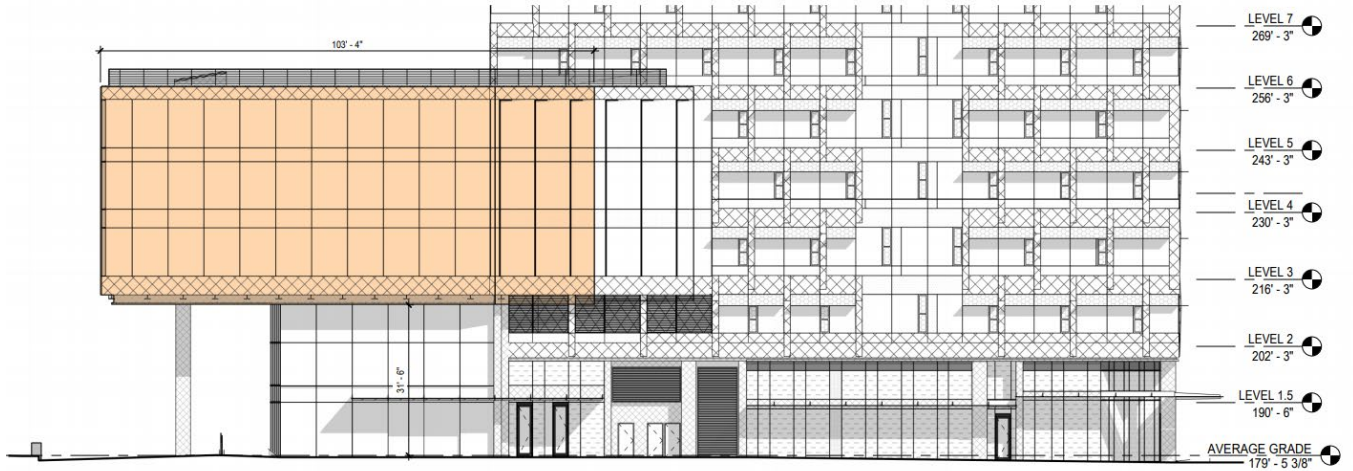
Elevation showing Building Overhang into Build to Line on 108th Ave NE
